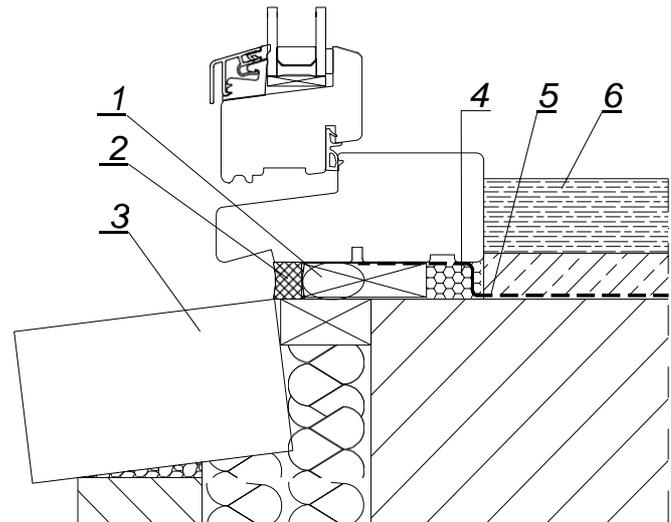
Example of window threshold sealing in wall with brick outside sill
